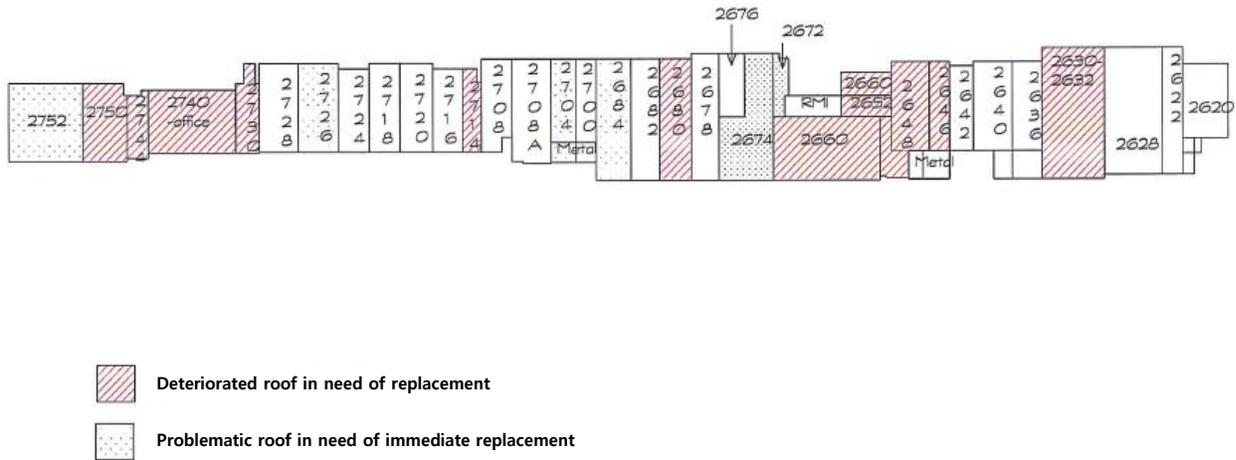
Depiction of a drawing prepared by Stiles Roofing, Inc. indicating damaged conditions of roofs on Brentwood Center North in need of replacement/repair.
